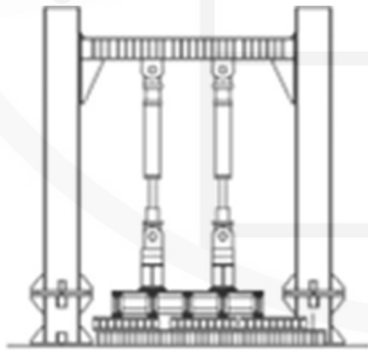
Loading setup diagram for the prestressed beam specimen.
